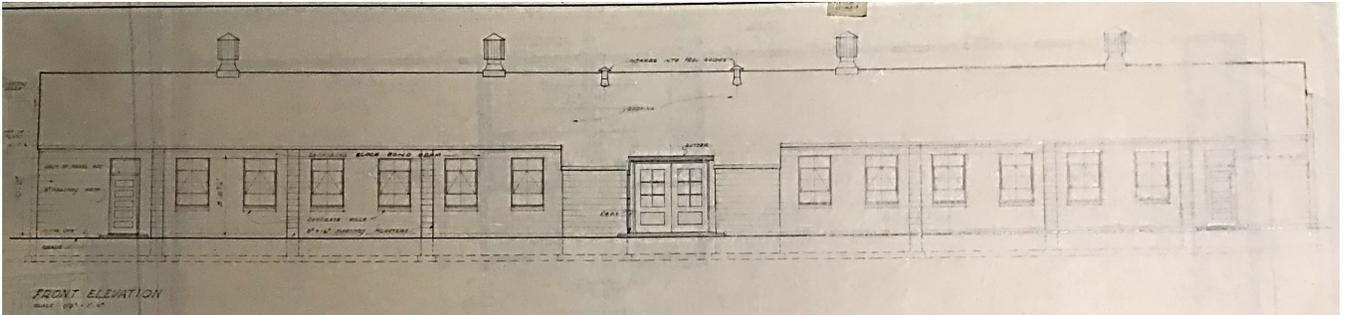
1953 architectural drawing of a typical Support Services Building, the design used for Tide Hall (CSUMB Facilities 2021)
